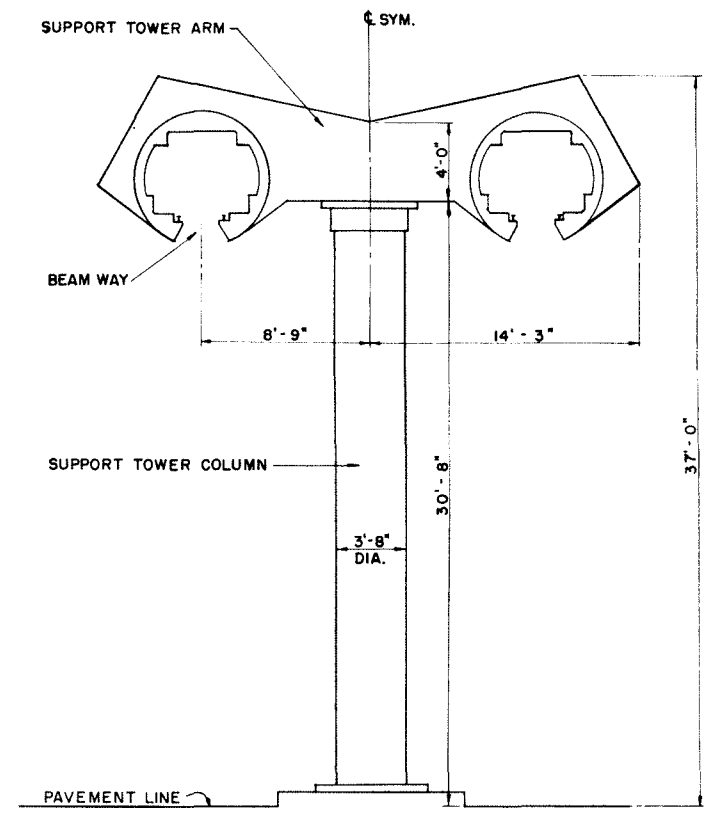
Typical support and beamway structures for overhead operation of rapid transit system.
